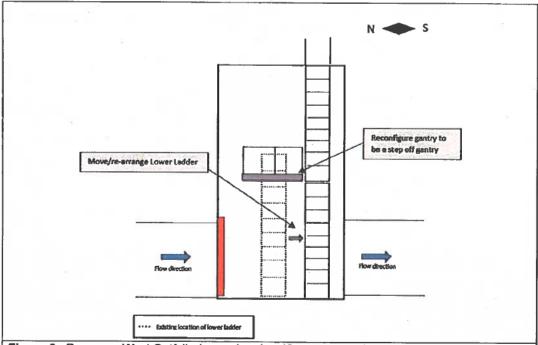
Pevensey West Outfall - Inner chamber (Coast Road). Conceptual new arrangement sketch (cross section)
